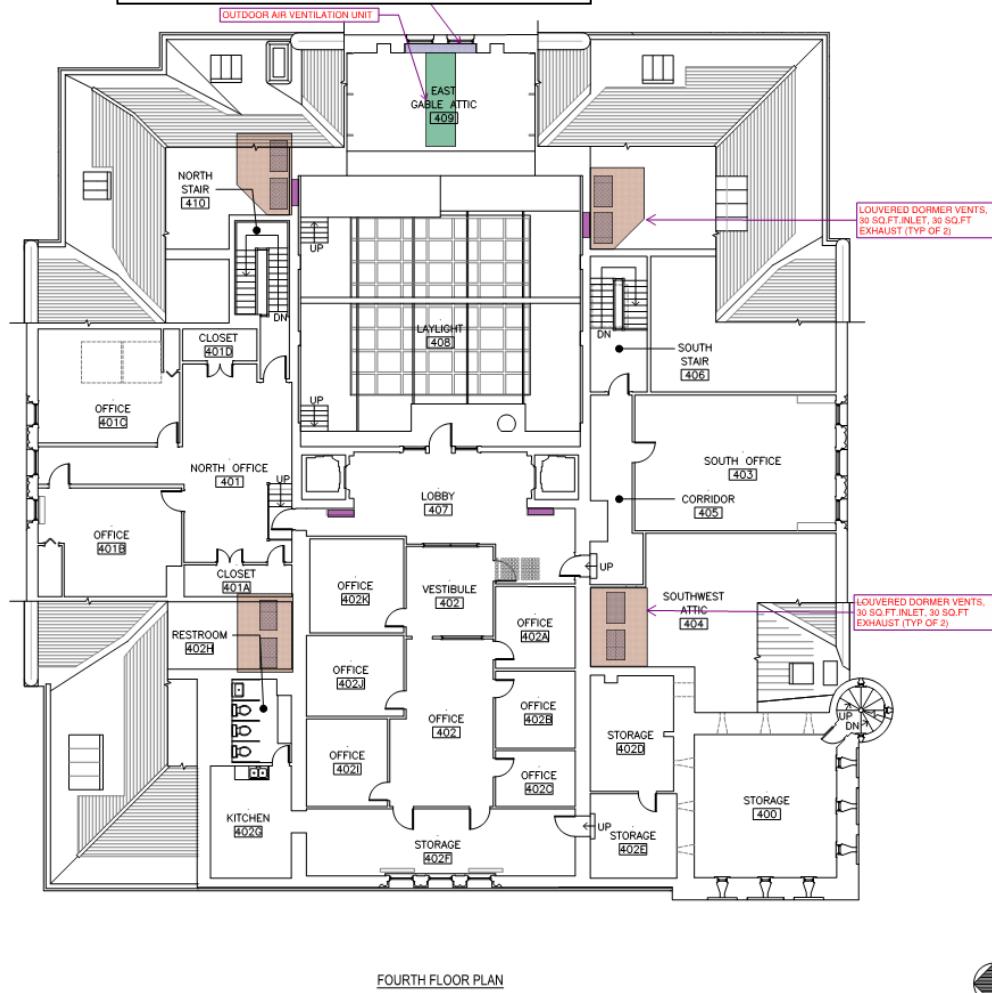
POTENTIAL ARRANGEMENT OF HEAT PUMP CONDENSING UNIT & VENTILATION UNIT AT ATTIC LEVEL
